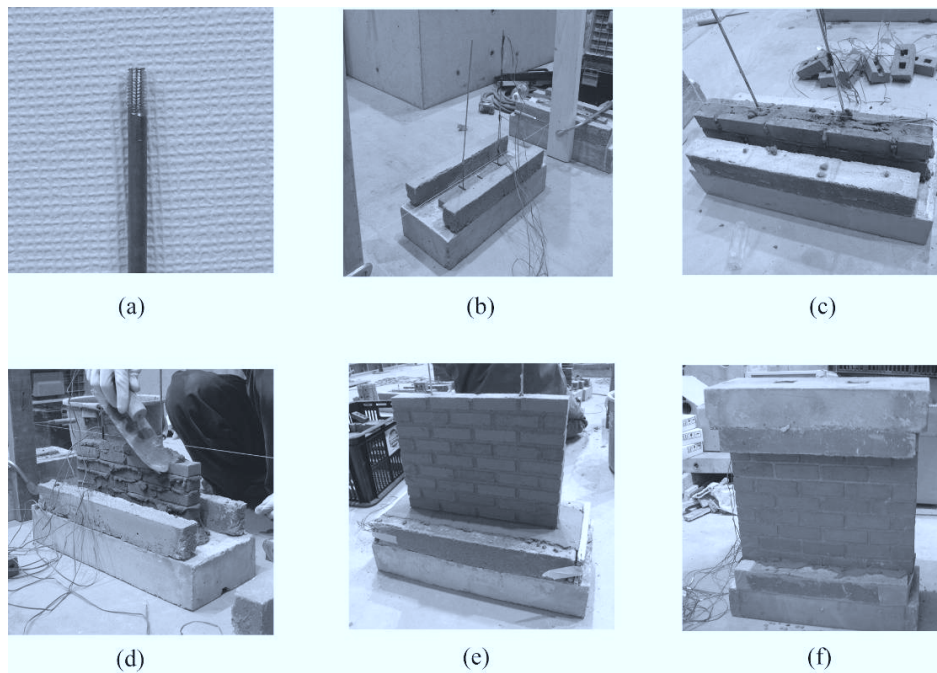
Processes involved during specimen preparation: (a) threaded SMA bar, (b) concrete block with SMA bar inserted, (c) position of coupler connecting SMA bar and stainless steel bar, (d) brick laying, (e) completion of brick laying, and (f) placement of concrete block support on the top of specimen.
